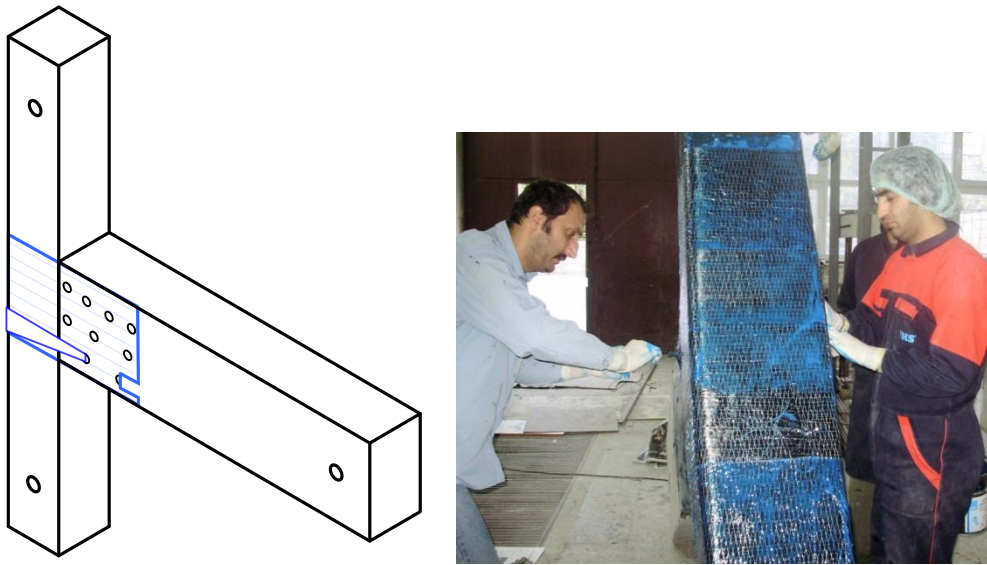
13. Anchorage Application on U-Shaped Wrap
